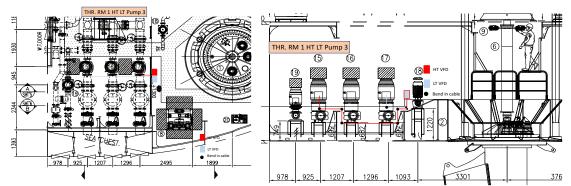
Thruster room 1 wiring plan (L.J.M. Verboven, 2023)
